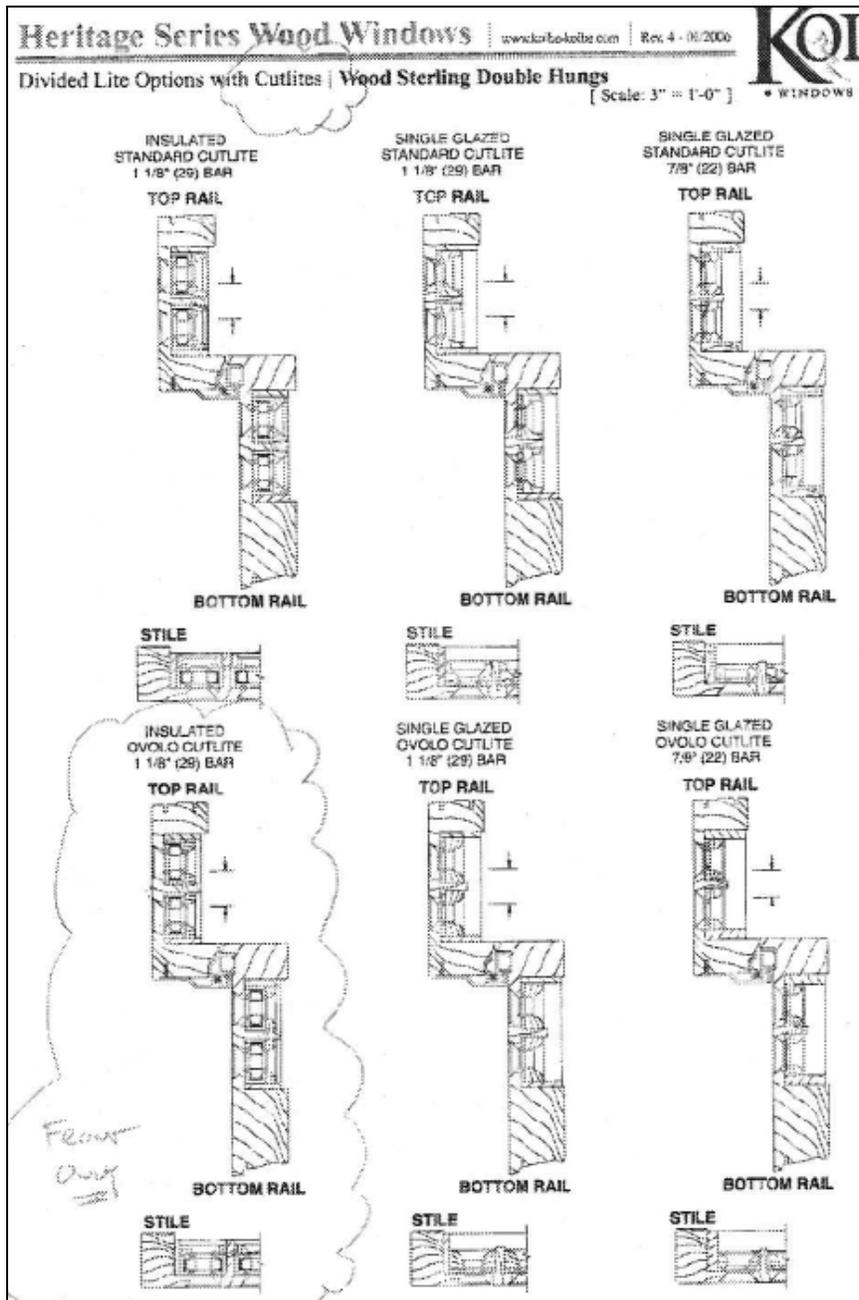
Window specifications for front windows: double-glazed, true divided light.
